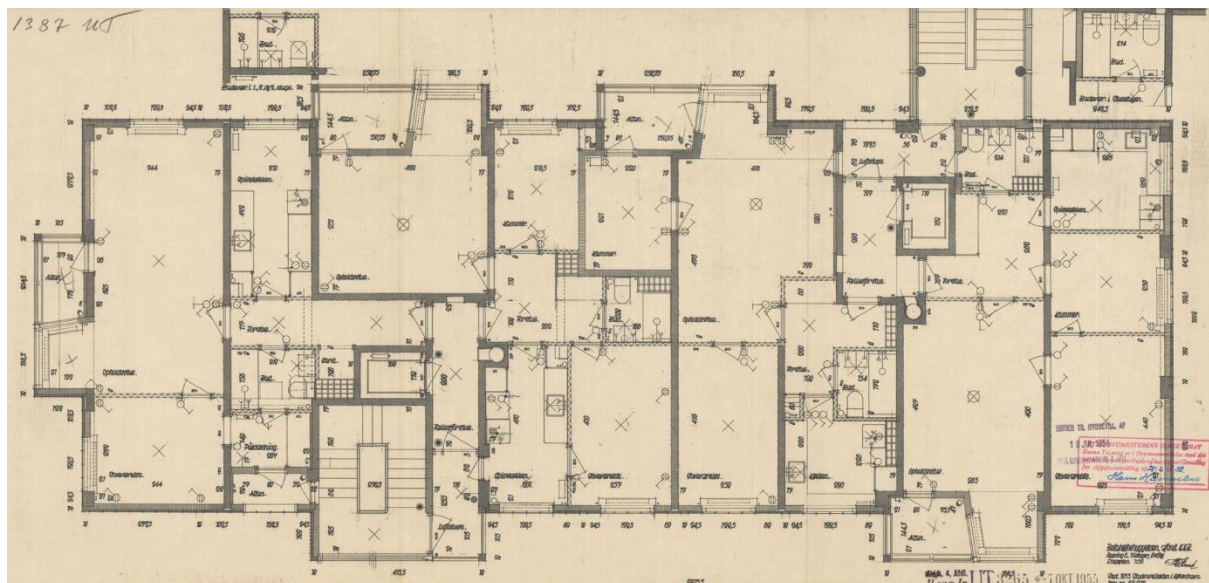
Layout of rooms and walls in Bellahøj SAB II building 6. Length of the building 28 m, and depth 10 measured from corner to corner.
